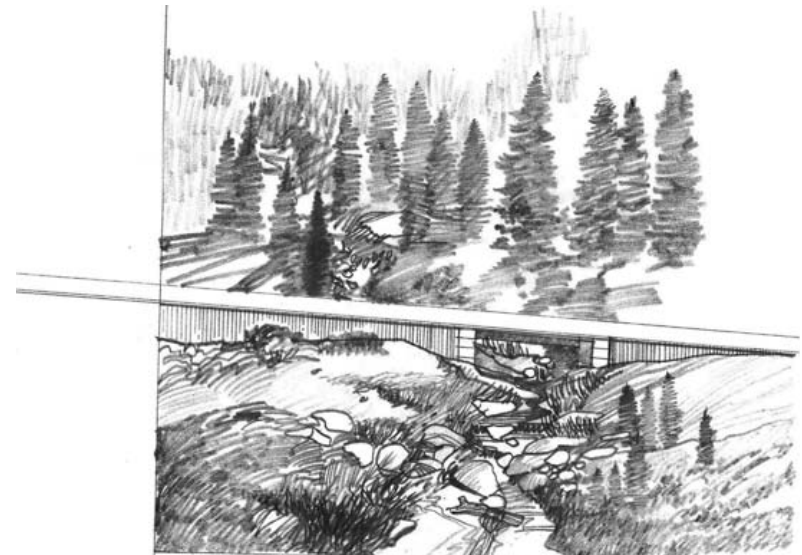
zc: The road bridges the creek so as not to constrict flow or degrade habitat.
